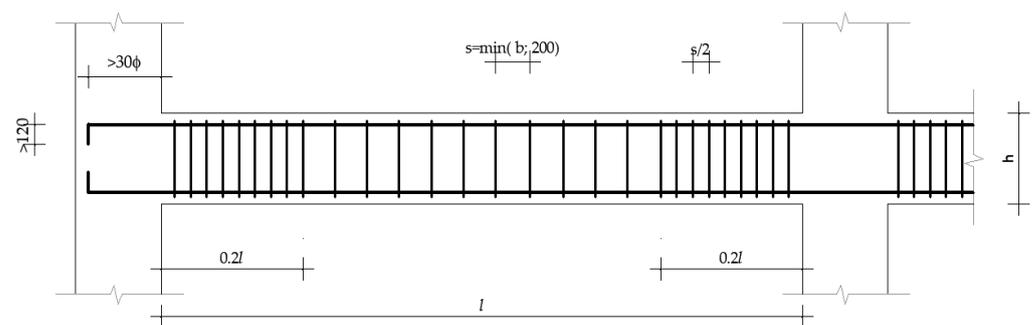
Seismic detailing requirements for beams in RC frames according to the PTN-S code.
